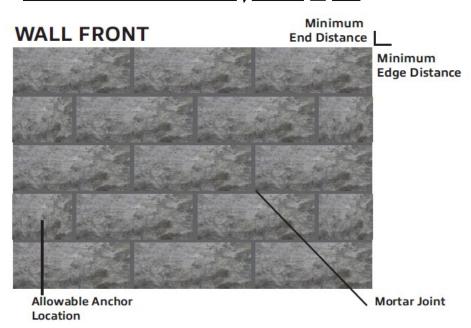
INSTALLATION LOCATIONS FOR COBRATAP CONCRETE SCREWS IN MASONRY UNITS
